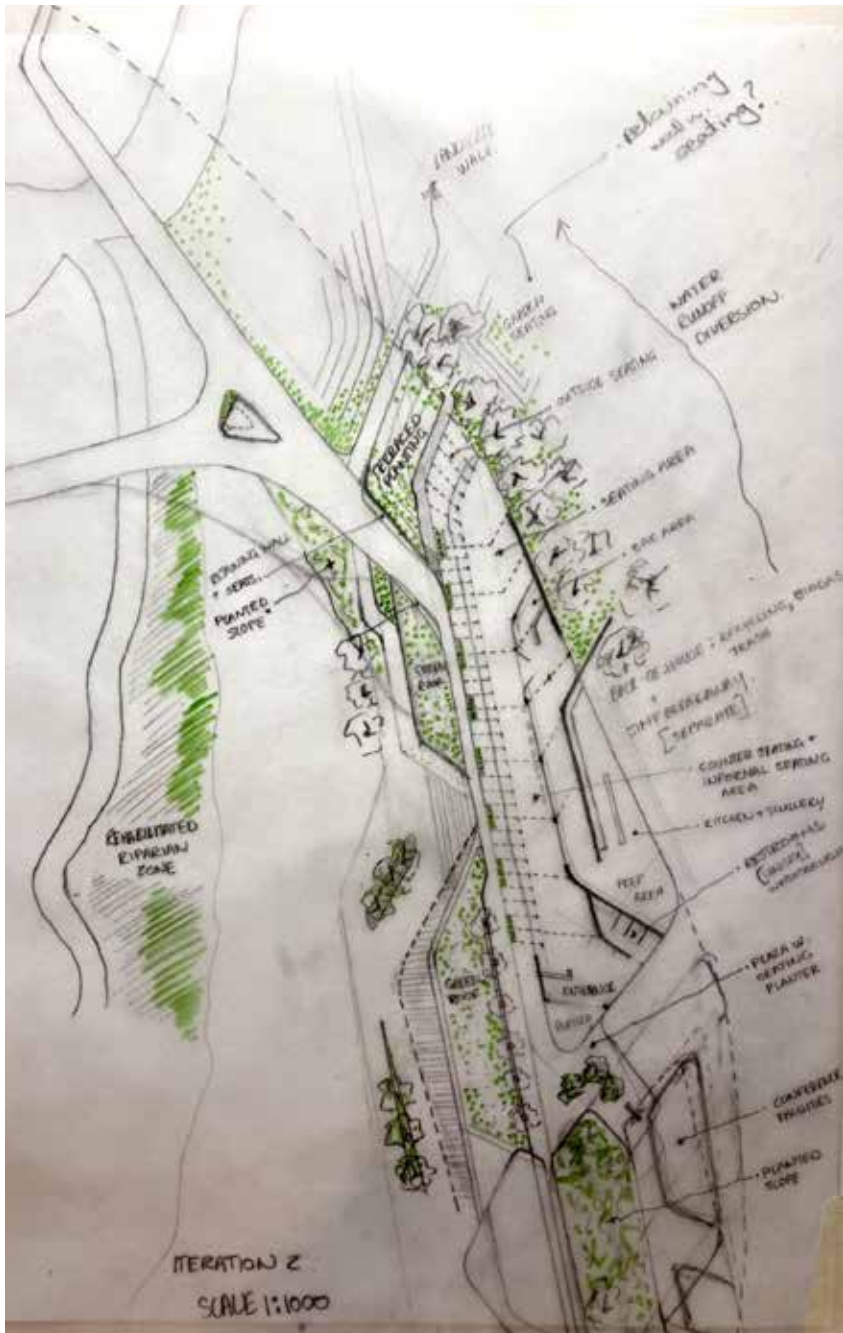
Floorplan development: restaurant (Author, 2020)
